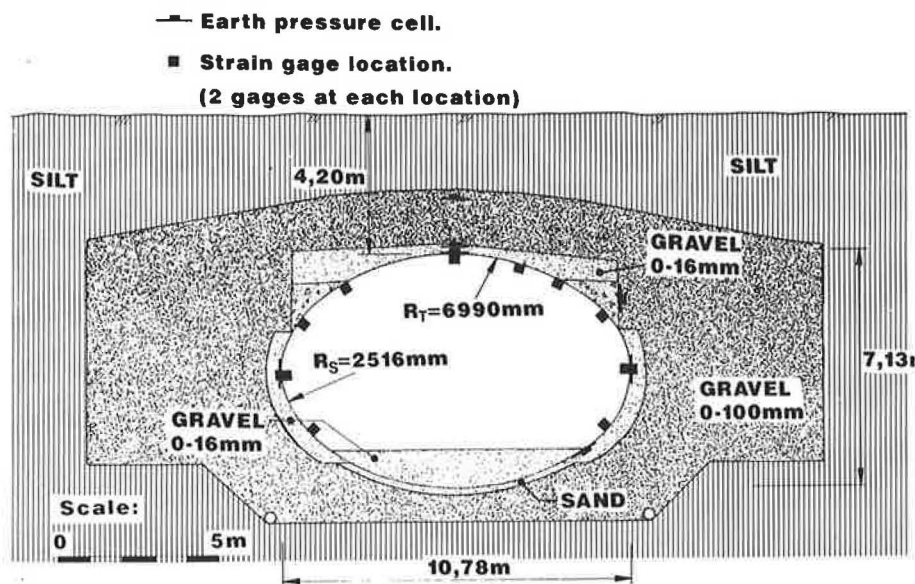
Geometry of instrumented cross section with location of the earth pressure cells and strain gauges (Dovre).
